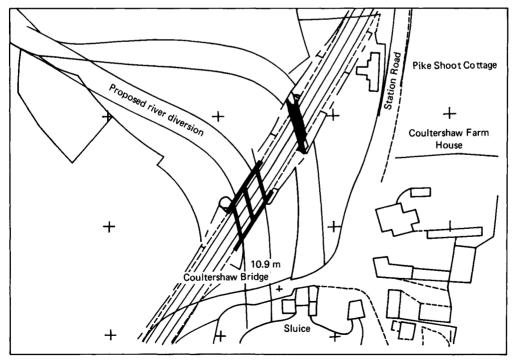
MOSS model taken from a graphics VDU showing an Ordnance Survey digital map, updated with a small road improvement, bridge detail, proposed river diversion, and culvert. (MOSS Systems Ltd, model courtesy of West Sussex County Council.)
